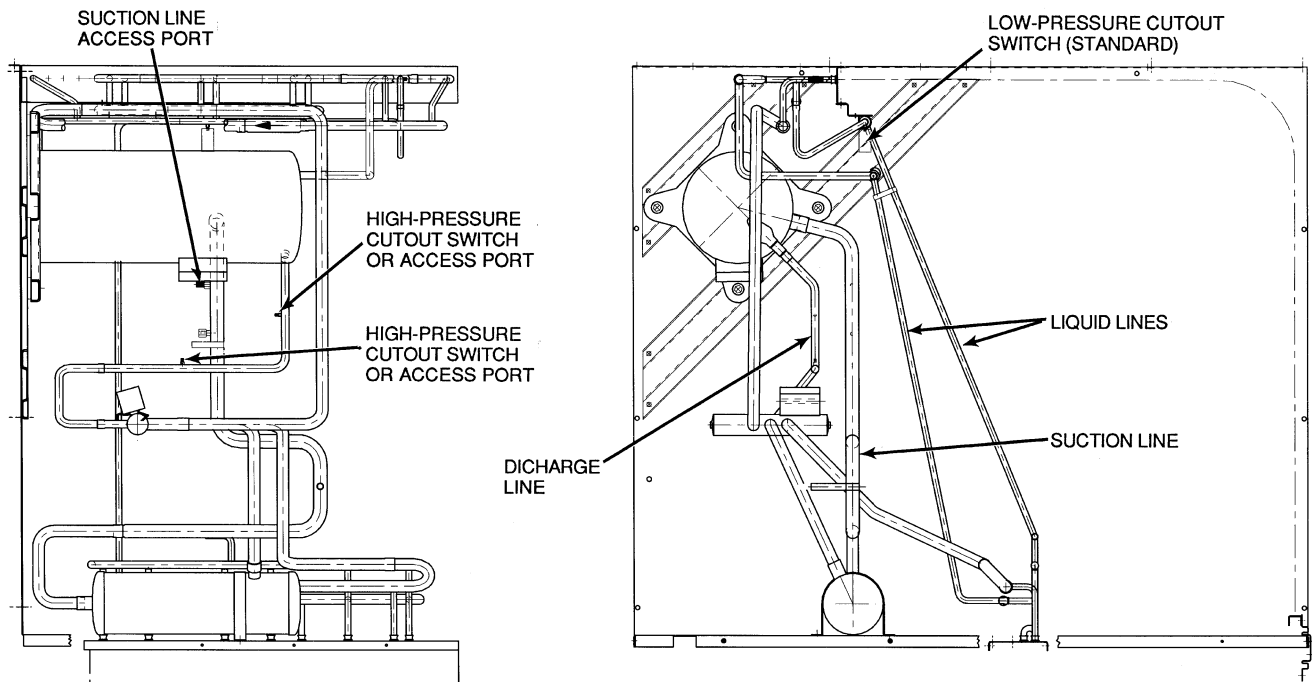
Typical High-Pressure Cutout Switch and Low-Pressure Cutout Switch Installation Locations (3 and 5 Ton Heat Pump Units Shown)
